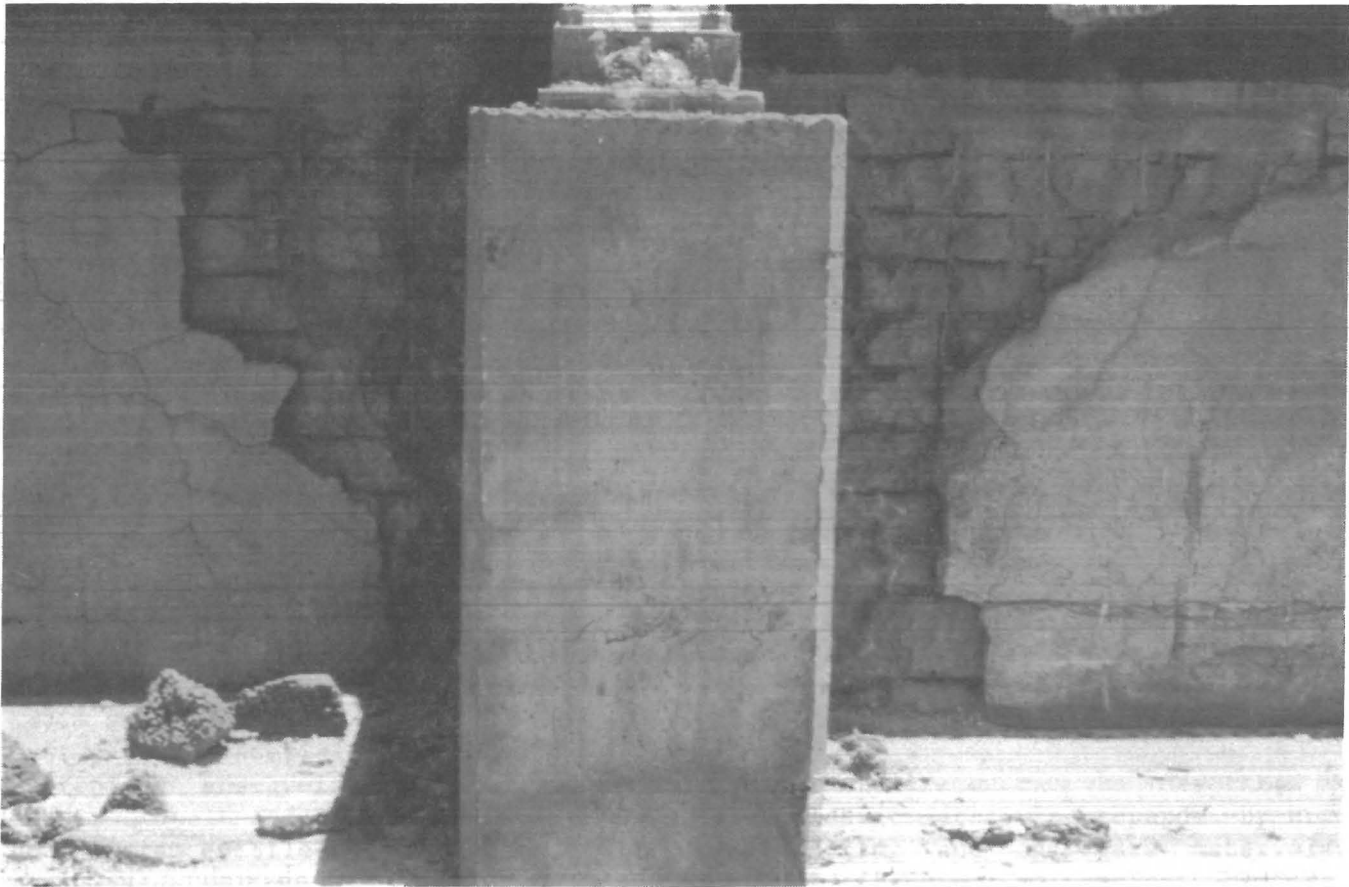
A sulfur concrete support pier used to replace a deteriorated portland cement concrete pier in a potash storage facility. Disintegration of the tilt-up portland cement concrete wall is evident behind the pier.
